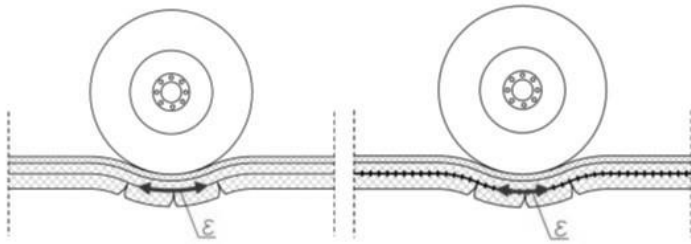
Schematic of fatigue cracking mechanism in pavement cross section without and with reinforcement.
